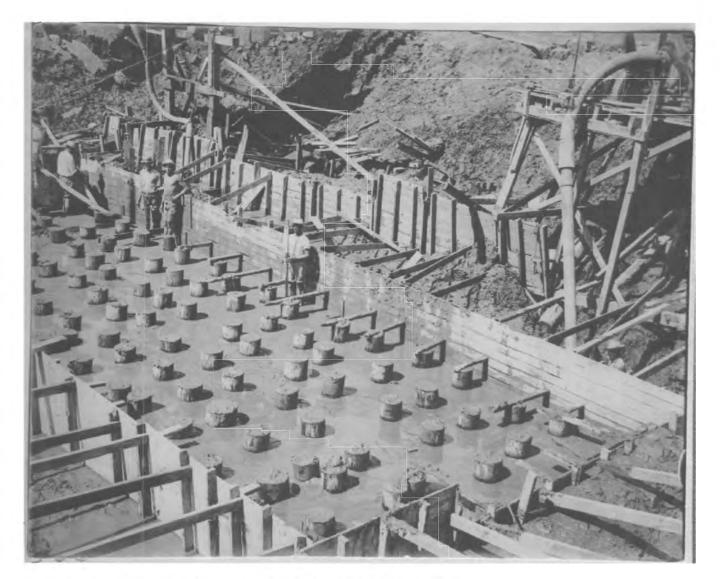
Bridge #65 foundations, 1942. AGPR, Archivo Fotográfico.
